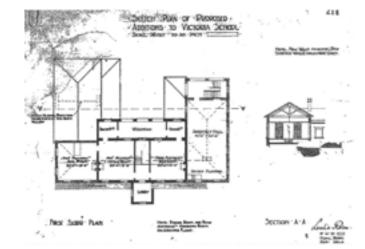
Sketch plans of the Victoria British School. (Source: Hong Kong Public Record Office. CO-129-414p214-221 Sketch plans for - Proposed additions to Victoria School.)
